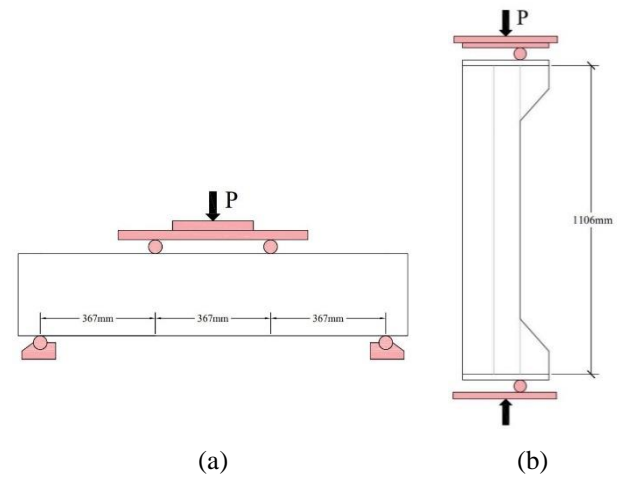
The general test setup for (a) GFRP reinforced concrete beam (b) GFRP reinforced concrete column [39]
